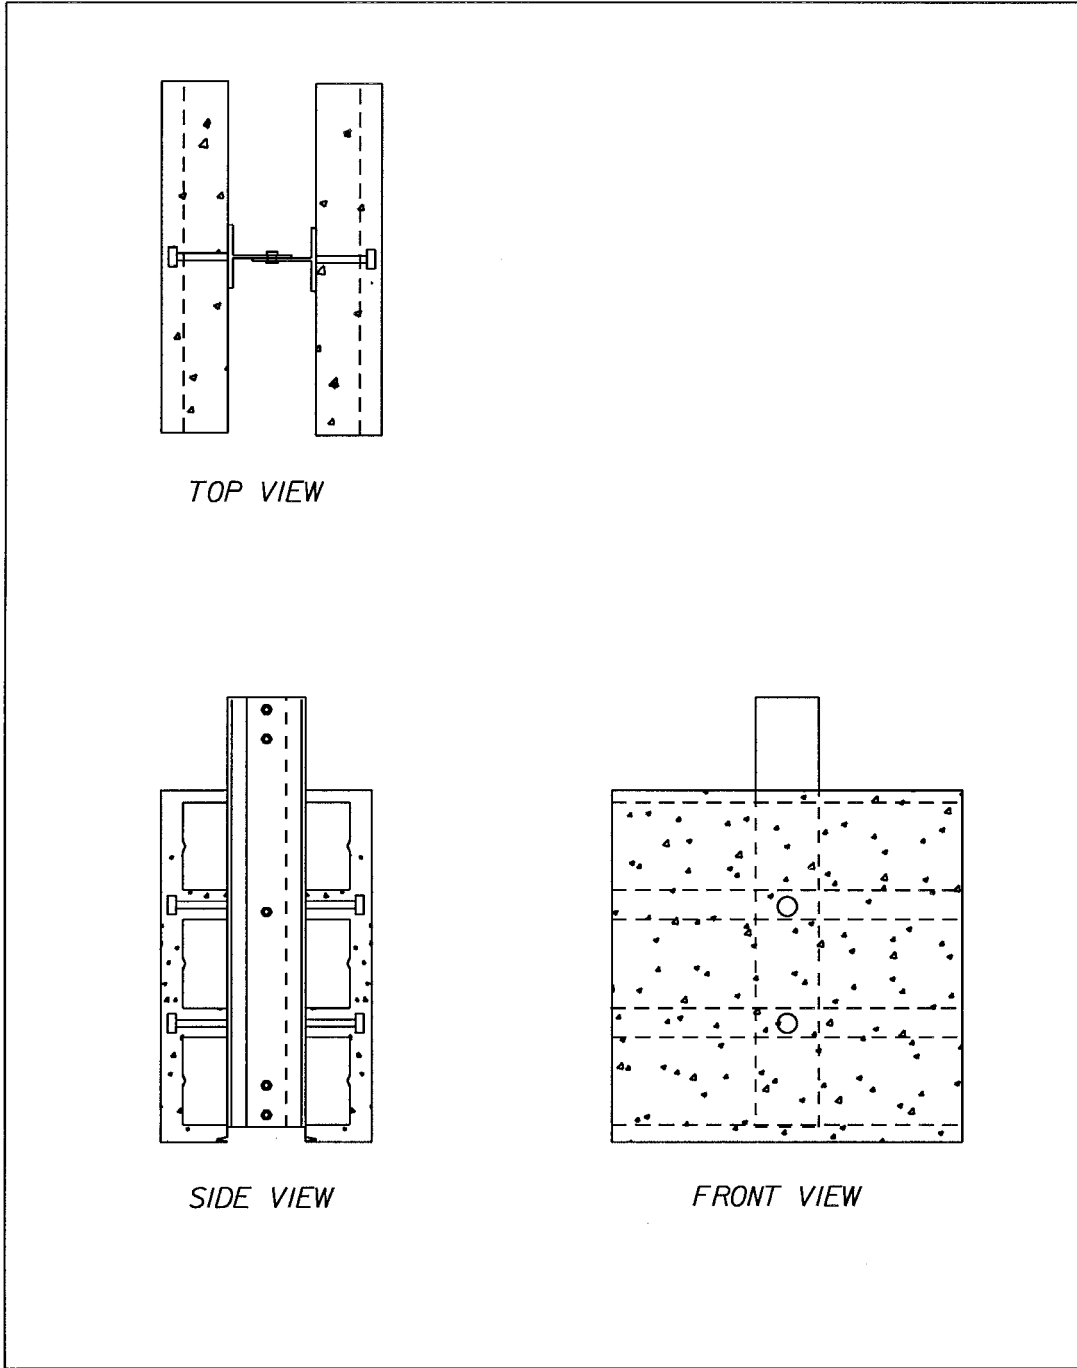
Composite Slab Push-Out Specimen with Studs in the "Middle" Position (Welded Wire Fabric not shown)
